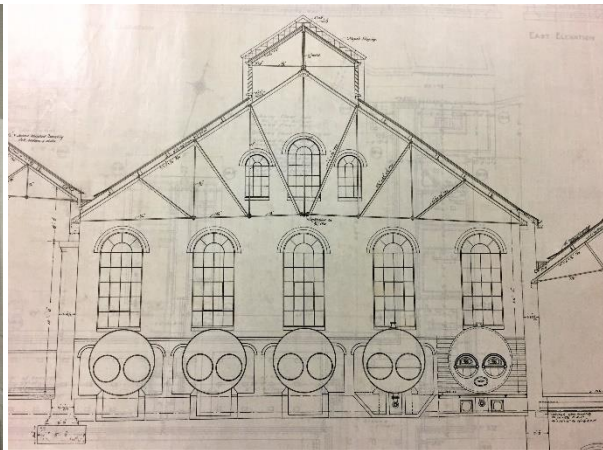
, Section drawing - highlighting roof structure. (Skinner, 2019)
